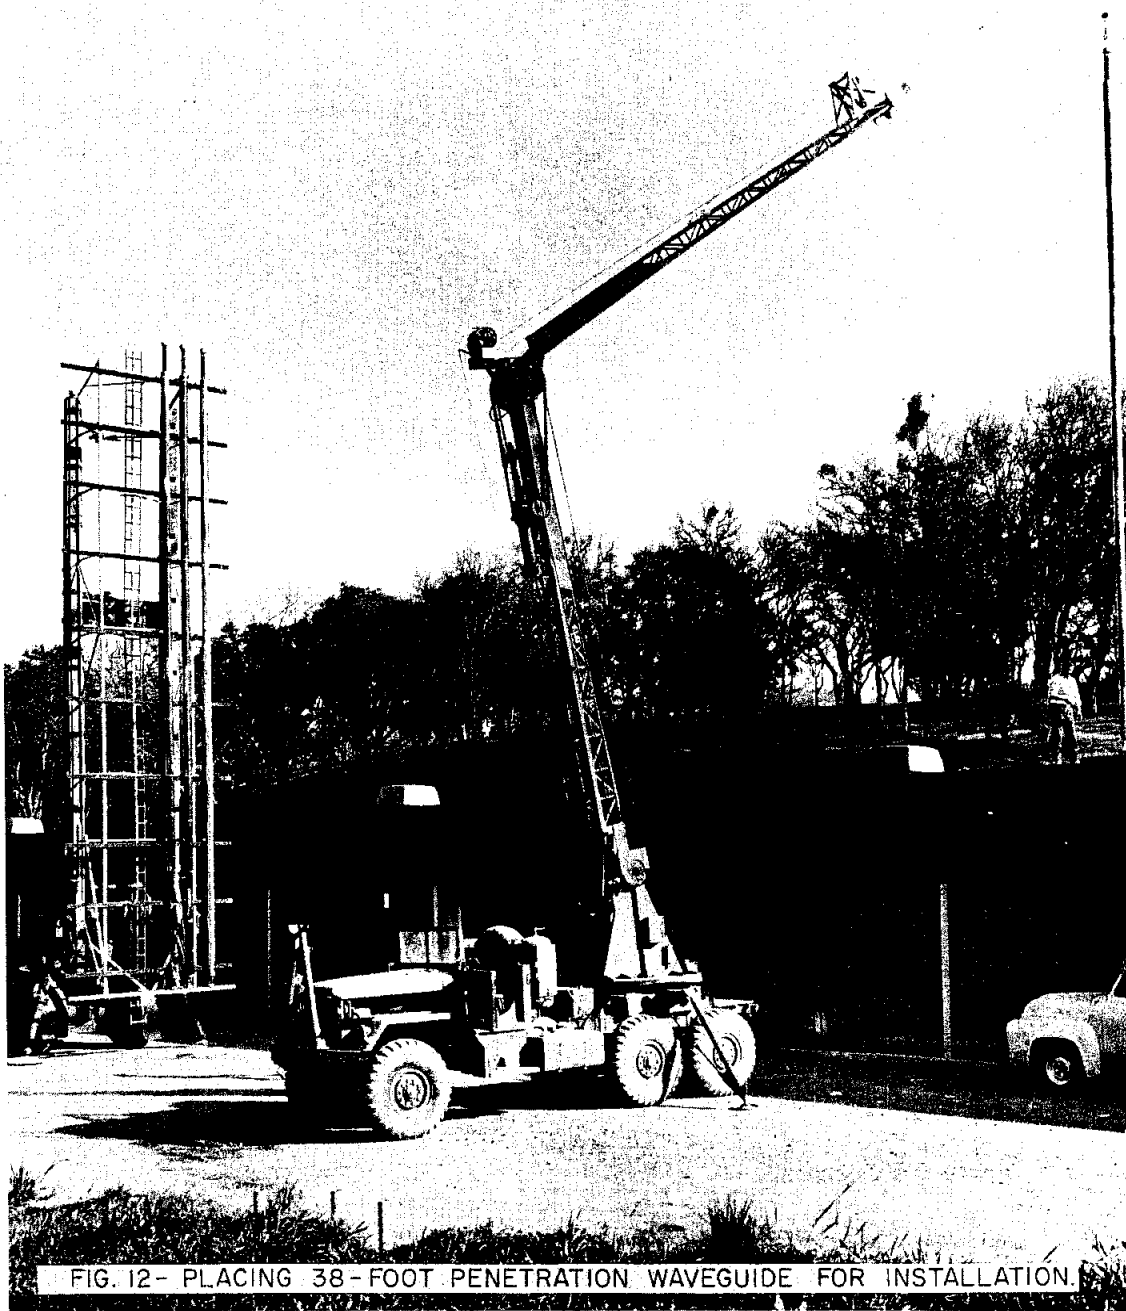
PLACING 38-FOOT PENETRATION WAVEGUIDE FOR INSTALLATION.
